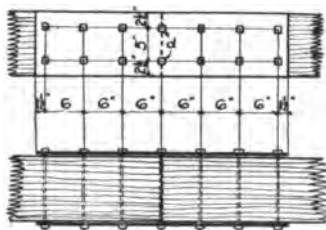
m*.—Joint in Beam with Steel Fish Plates.
